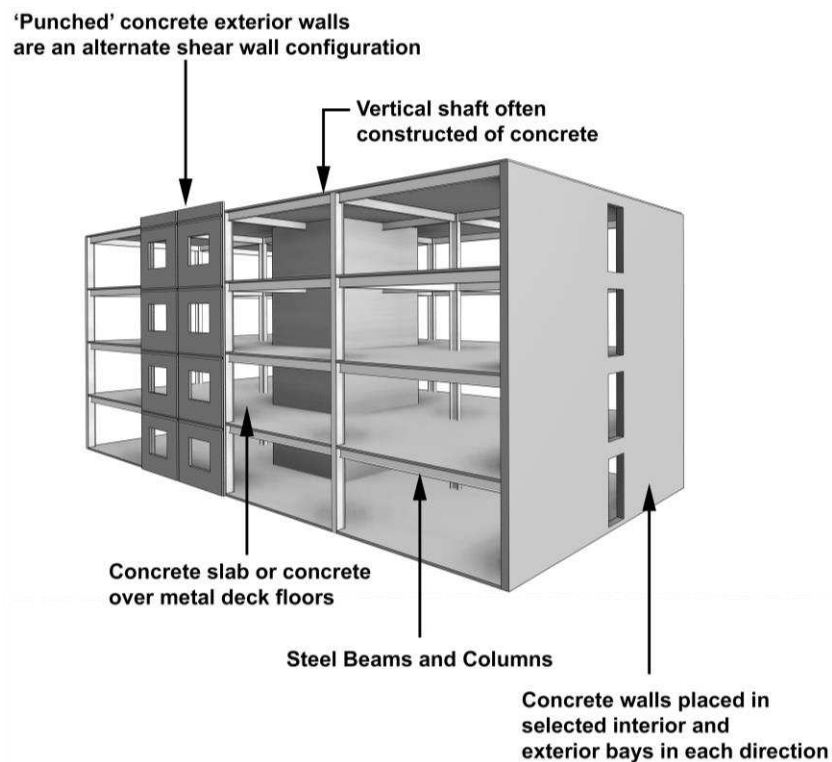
Schematic illustration of a SCW building (Figure adapted from FEMA 547, FEMA, 2006)
